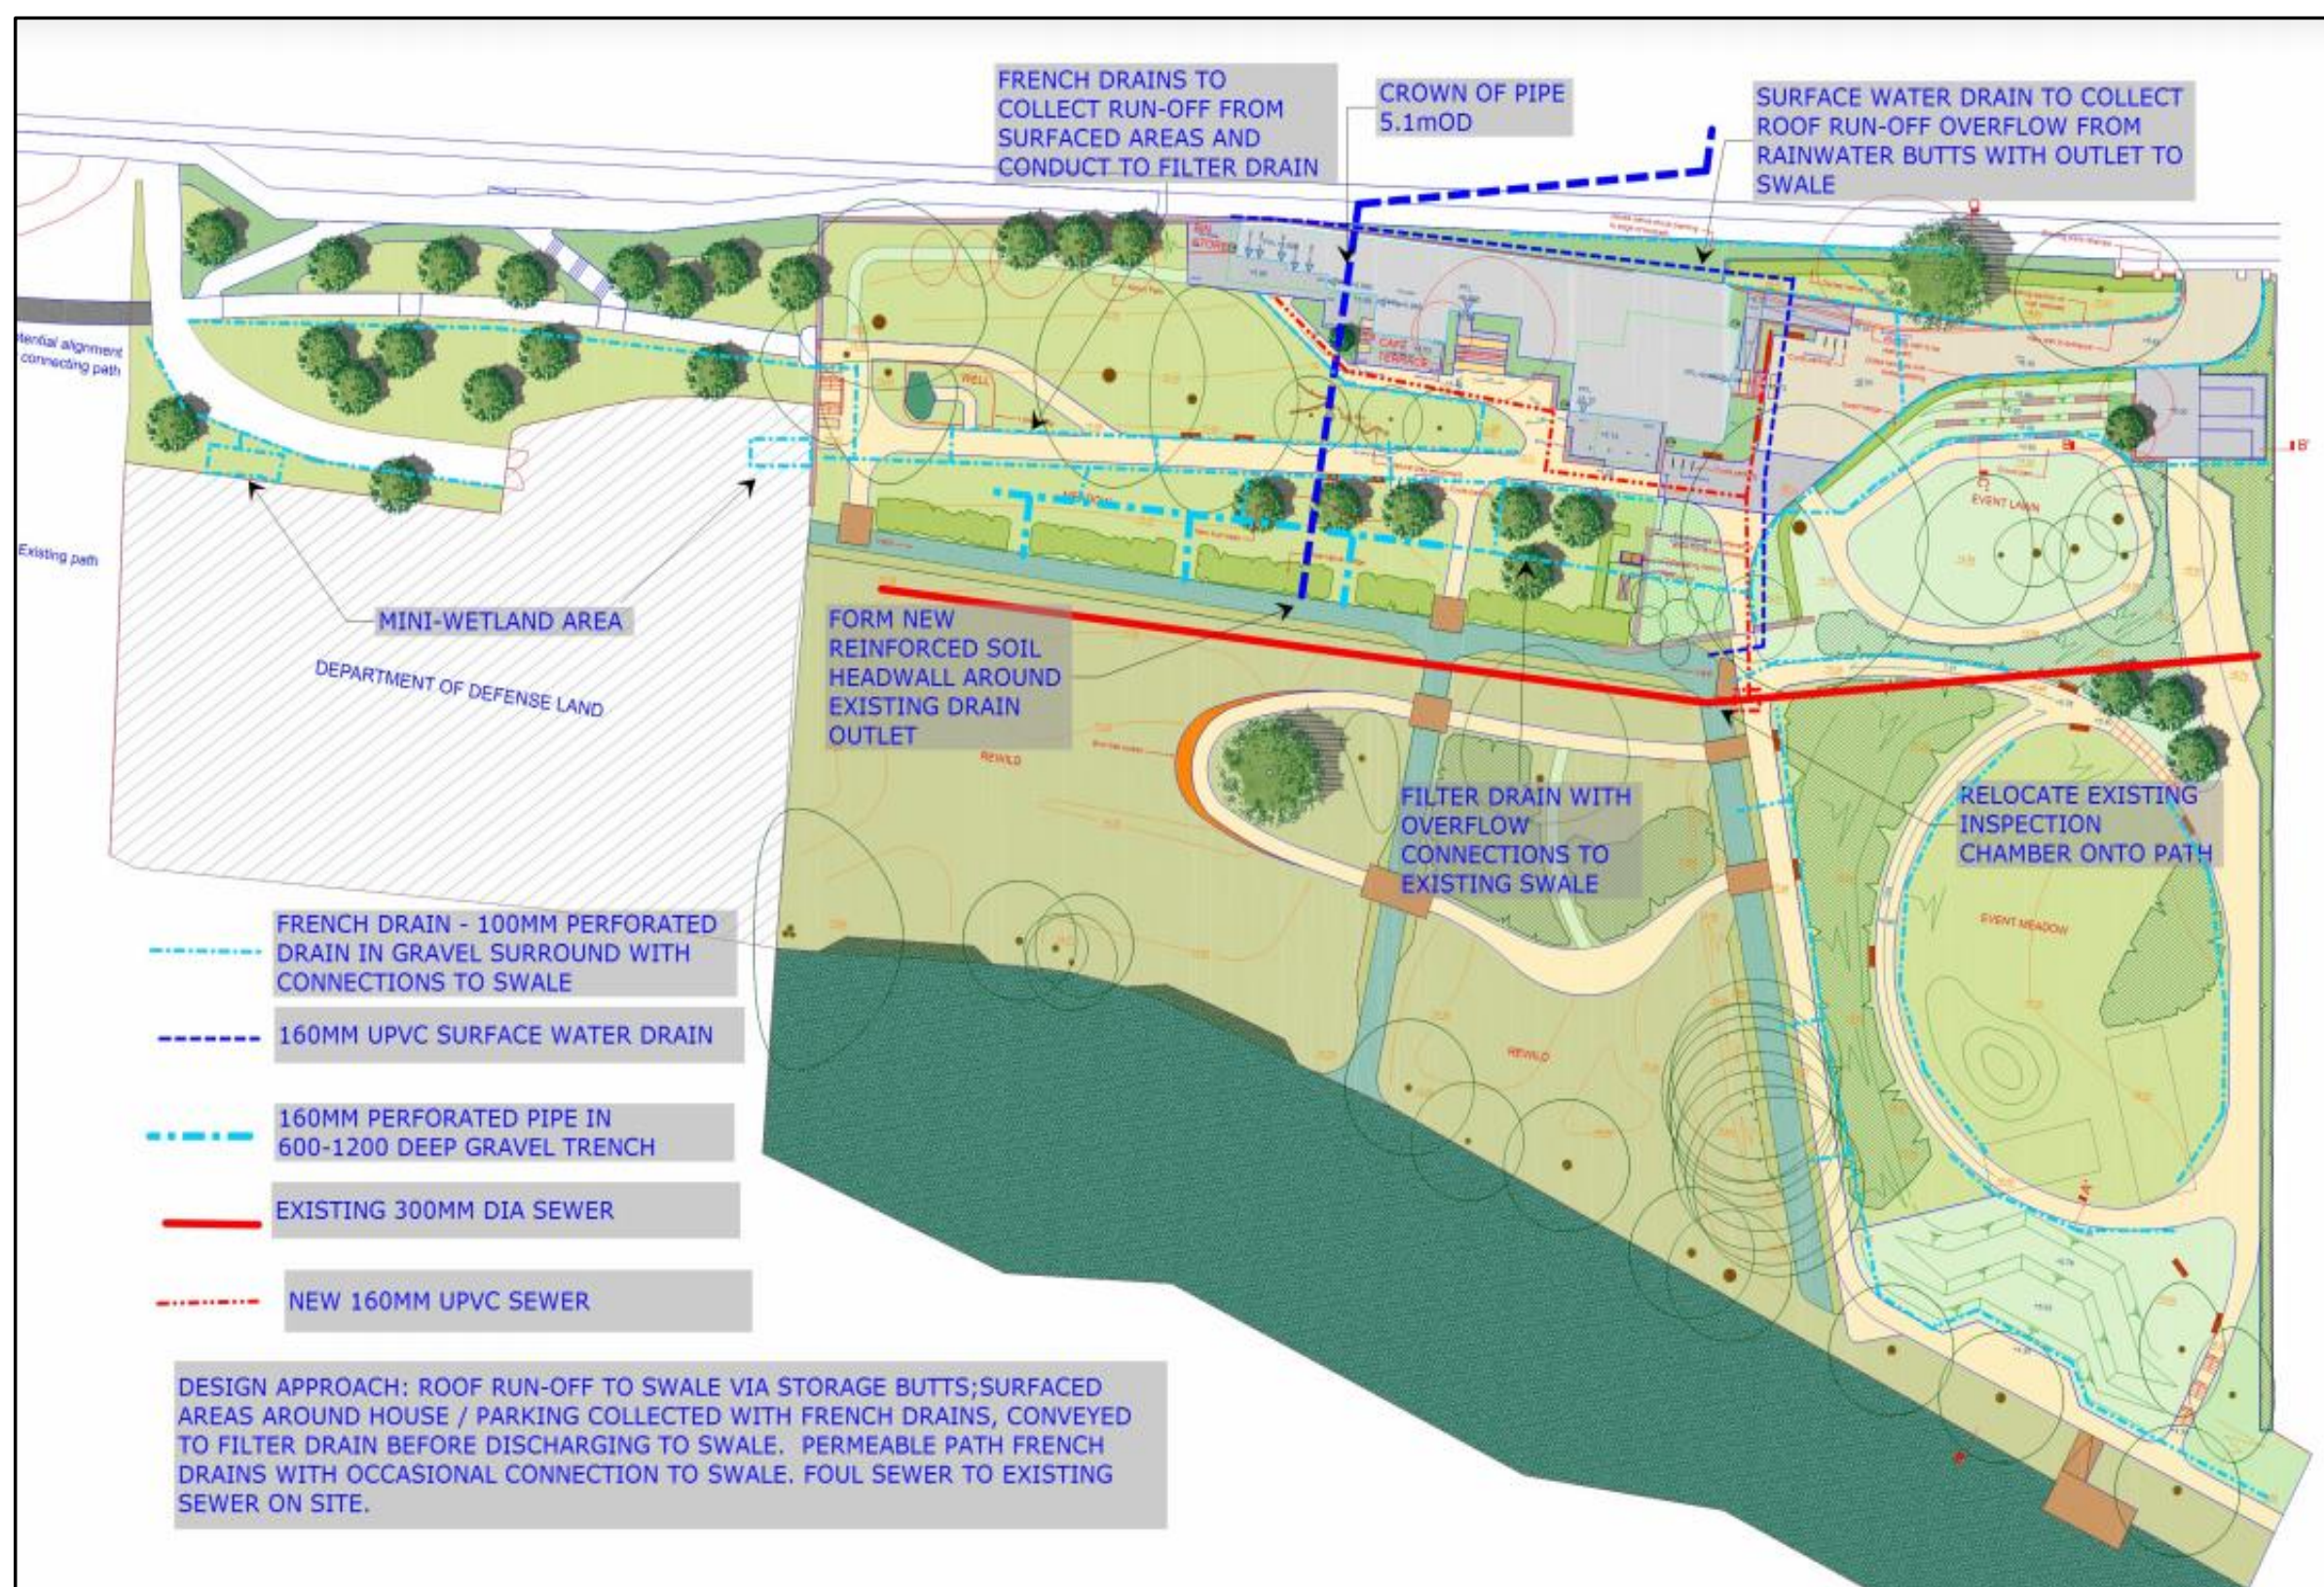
Proposed site plan - with additional lands - and drainage scheme
